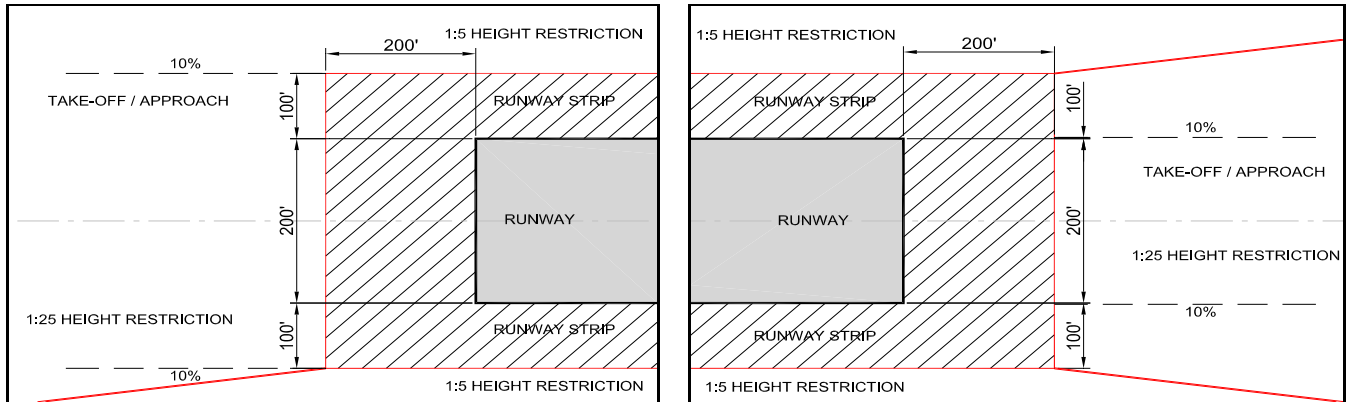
Plan View of Building Restrictions Adjacent to Airports
